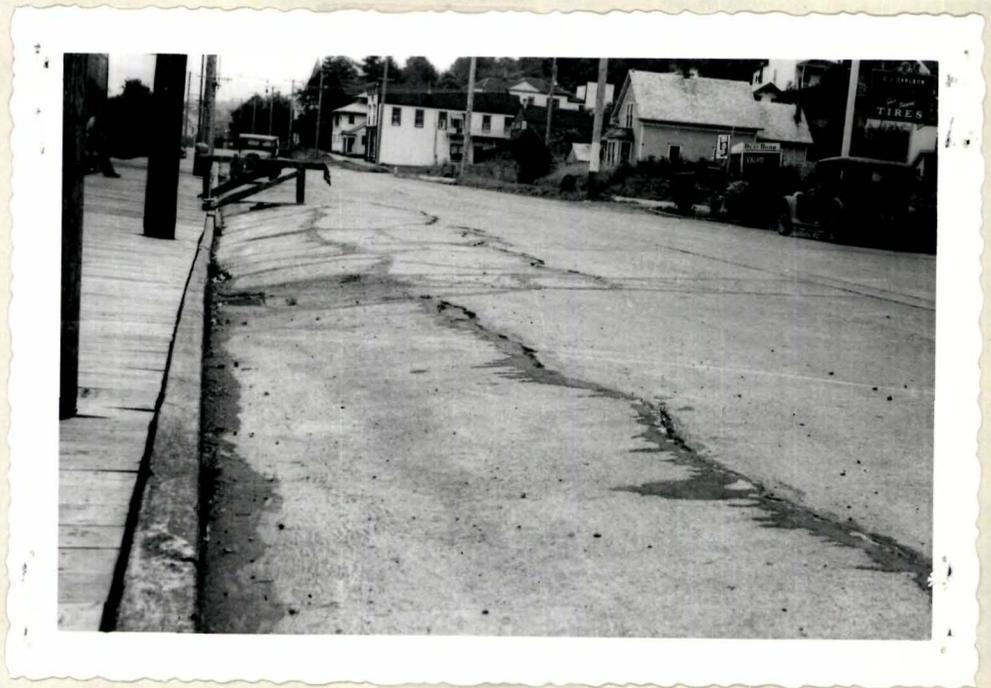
Settlement of curb and pavement in the year 1933 at Sta. 23+00 looking easterly down Water Street.
